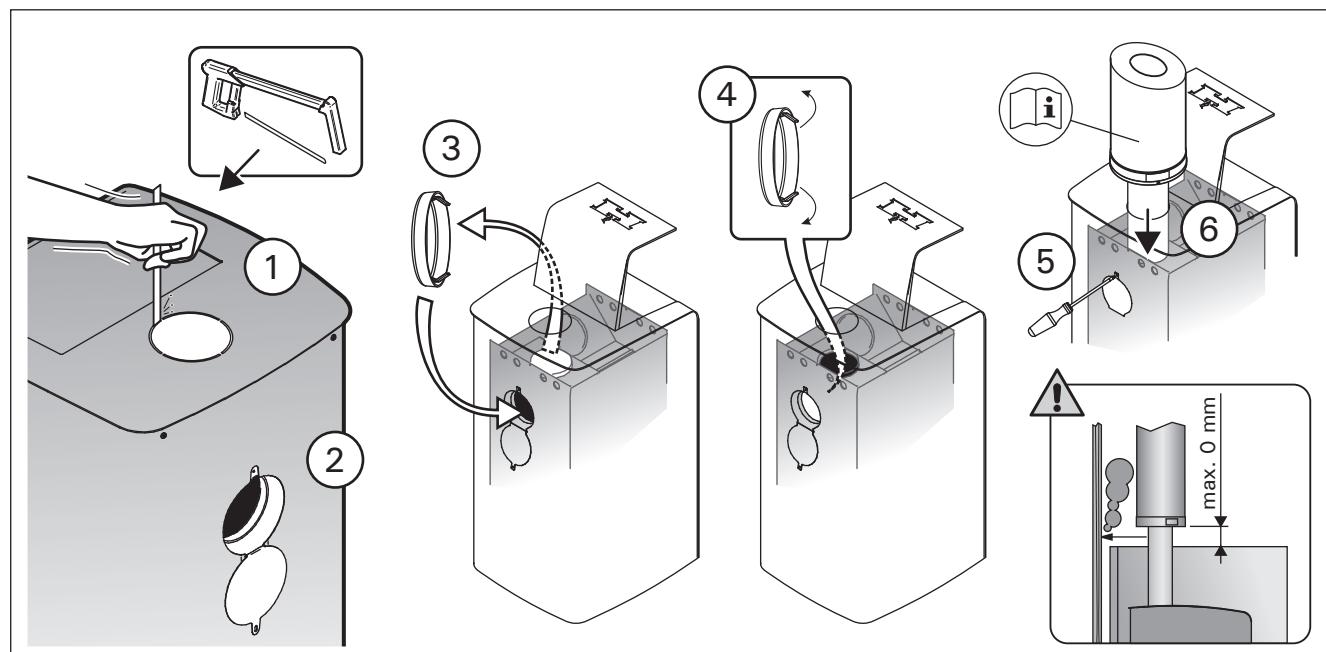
Connecting the stove to a Harvia steel chimney (all dimensions in millimeters)
